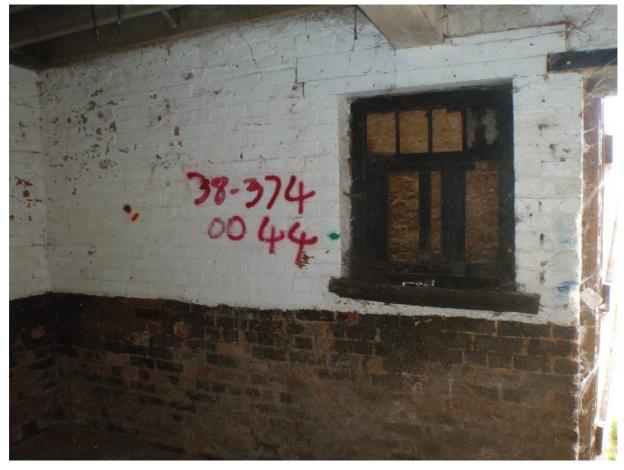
Interior of southern room, east range, showing ventilator grille, looking south
